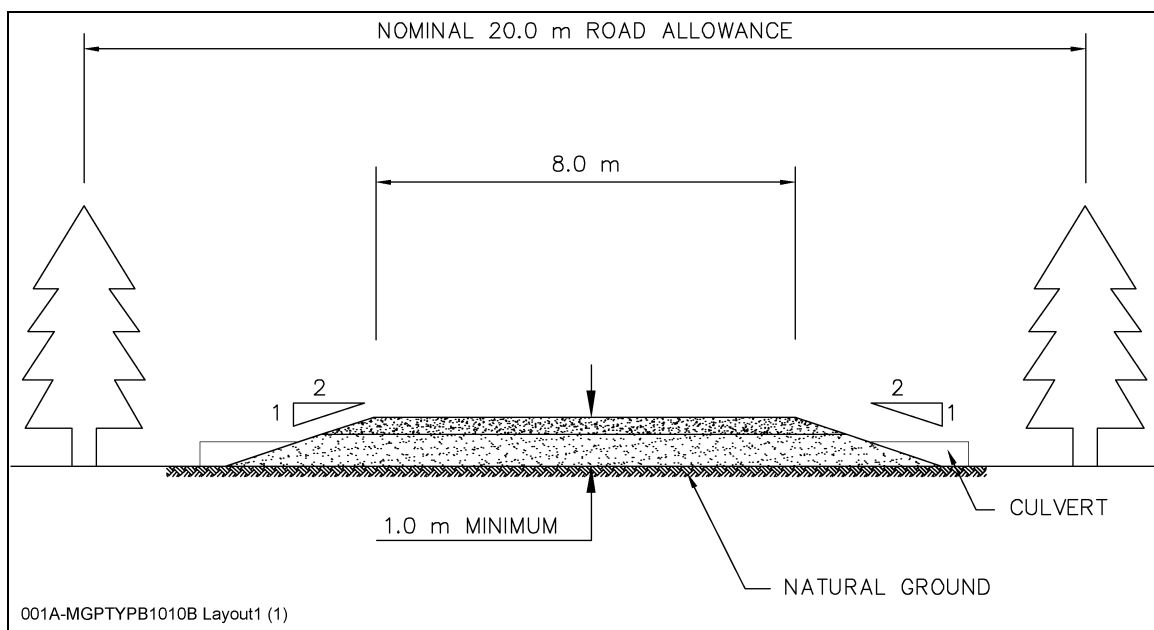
Typical All-Weather Access Road (8.0 m)
